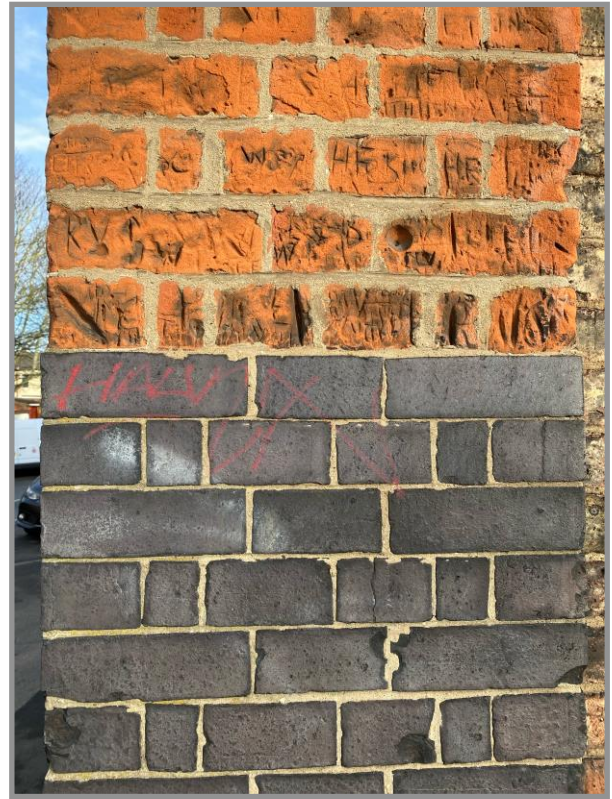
Detail, base of brick giant-order pilasters on corners and central bays of principal elevations. Lower brick work is in harder black brick. The black brick detail is followed through horizontally to the window brick quoins. See Figure 18.
